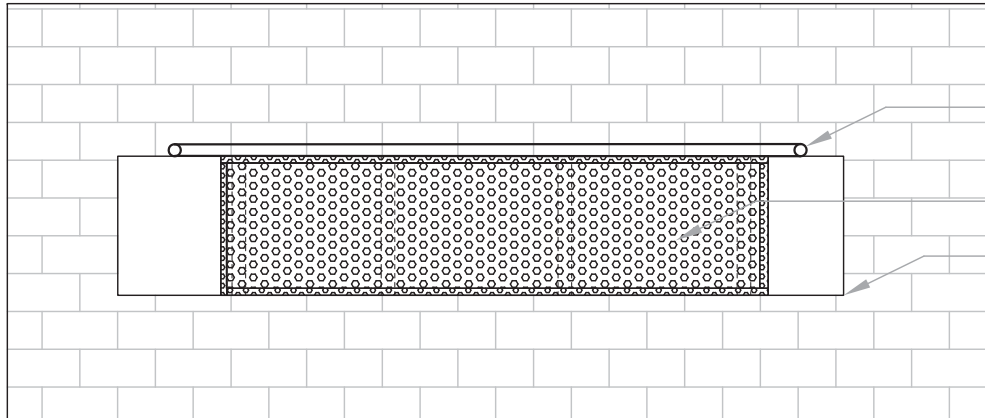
Bench with backrest. Section. Scale 1:25 (Author, 2008)
